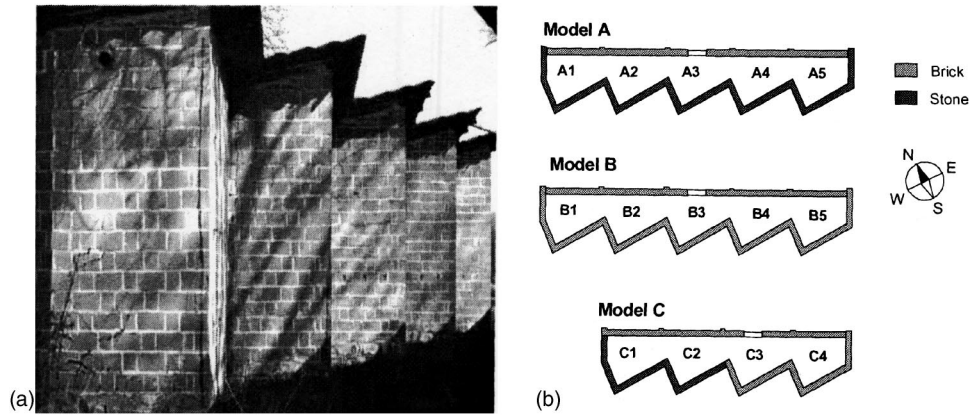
Full scale outdoor specimens: (a) specimen B: stone panels and (b) design of specimens
